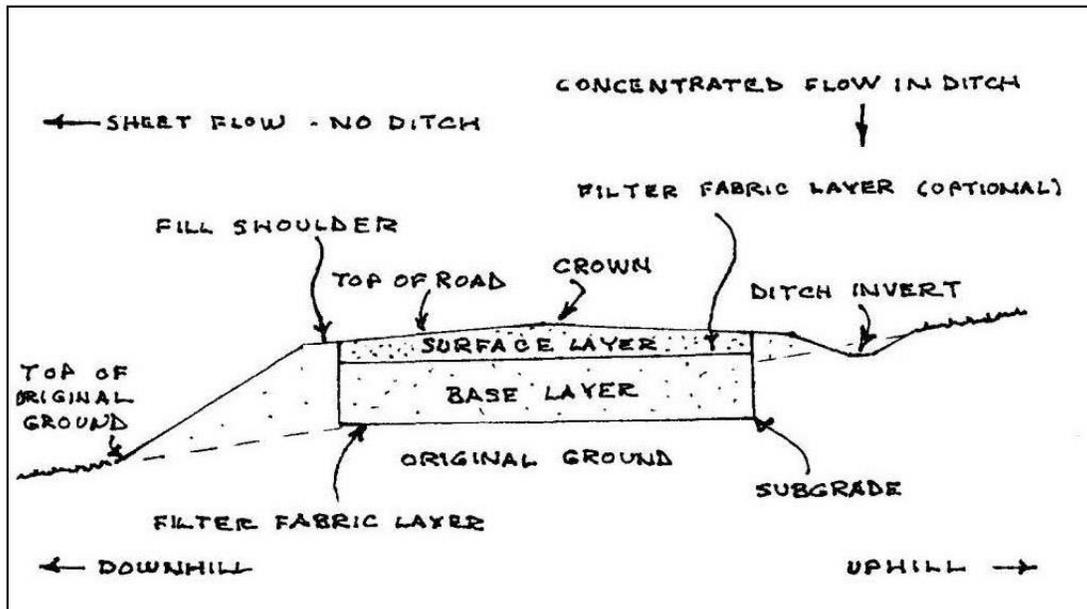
Typical Road Cross Section (Canaan, New Hampshire Highway Department 2013).
